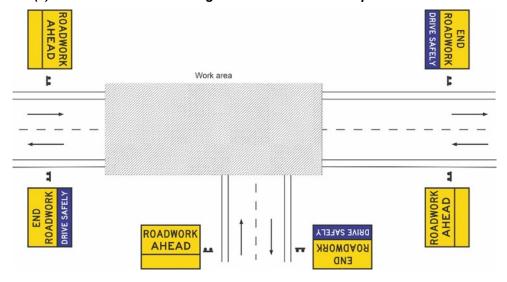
(e) – Roadworks on a through road which has an impact on the side road
